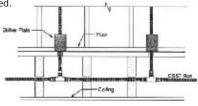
Multiple Outlets Along Main CSST Run (Horizontal & Vertical Runs)
